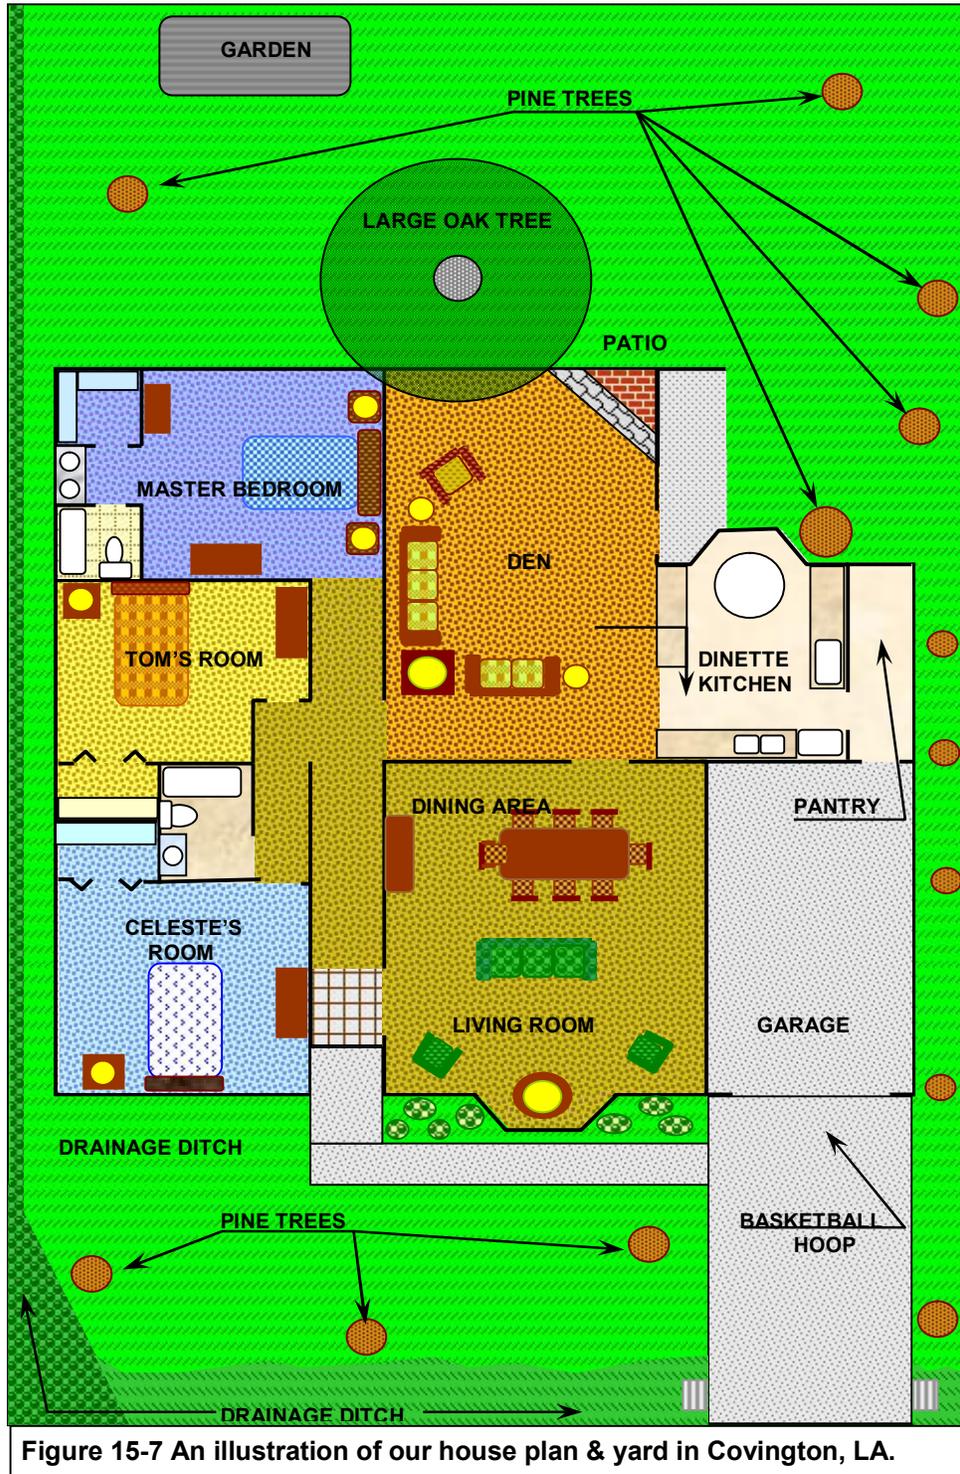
An illustration of our house plan & yard in Covington, LA.
